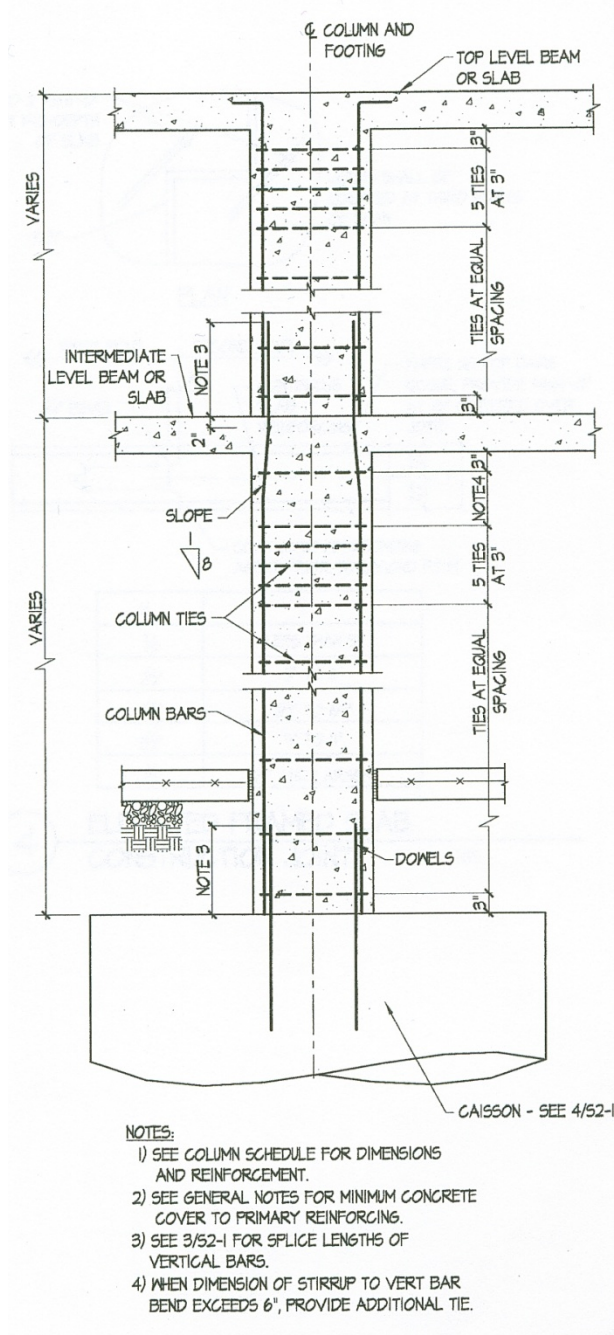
Typical Column Caisson Connection and Column Reinforcing
